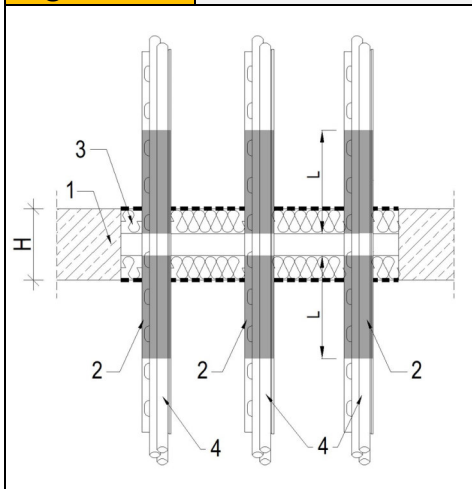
Large cables penetration seal, single or double mineral wool board
